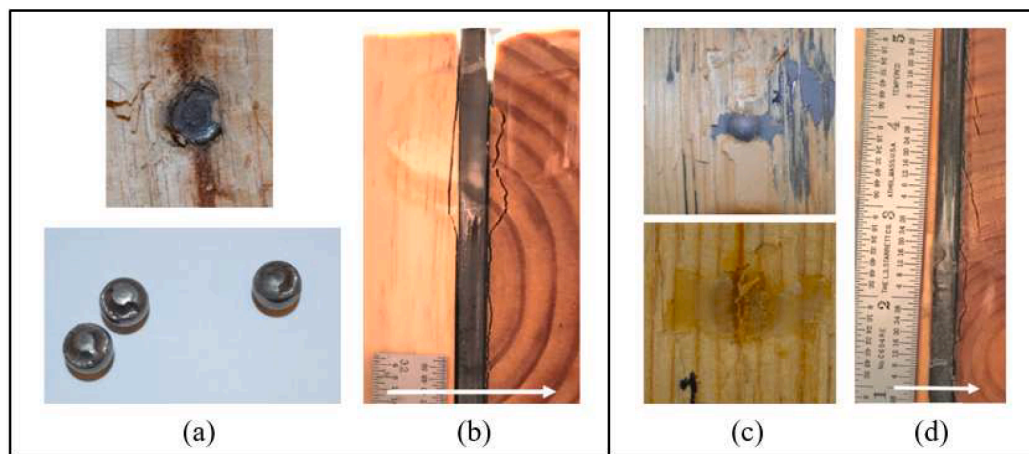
(a) Plugging failure of hard steel plate embeds projectile sized plug into 3-ply face (b) Wood fracture observed after test shots at wood-hard steel interface (c) Bulge formed in mild steel and indentation in 3-ply CLT affixed behind steel (d) Evidence of wood fracturing at wood-mild steel interface.
